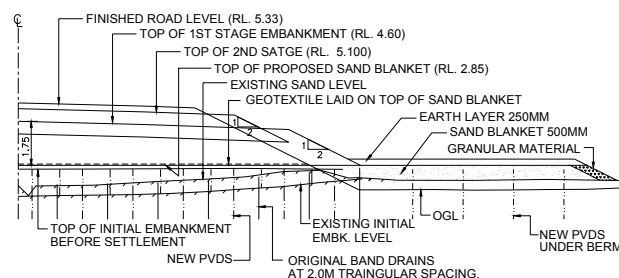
Corrected Embankment Profile with remedial measures after failure – Typical Section at chainage 4+300 km.
